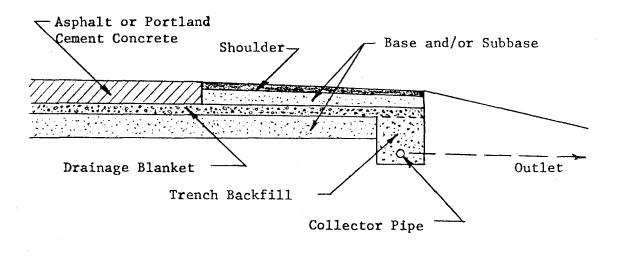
Typical Location of Shallow Longitudinal Collector Pipes
